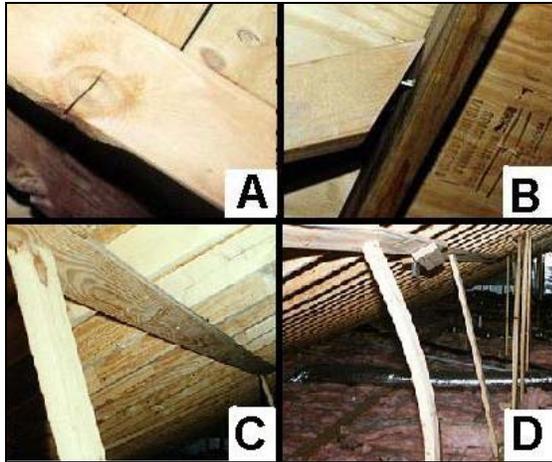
Inherent deficiencies in the roof structure not caused by wind: A) large knot with old crack, and B) gap where rafter intersects ridge beam, C) bowed purlin from lack of support, and D) warped bracing from inadequate bracing.
